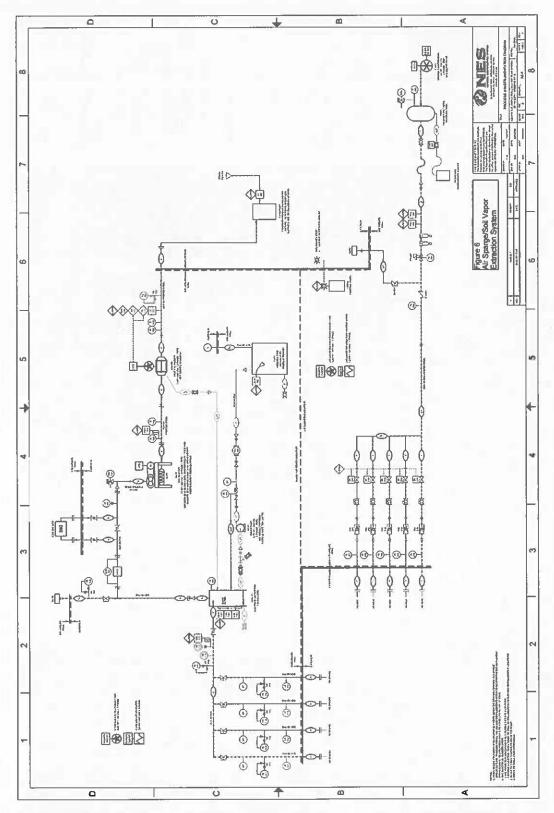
Process and Instrumentation Plan – Air Sparge/SVE System
